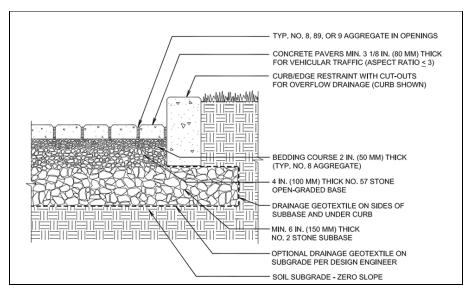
Standard Detailed Drawing of Permeable Interlocking Concrete Pavement (ICPI, 2022)
